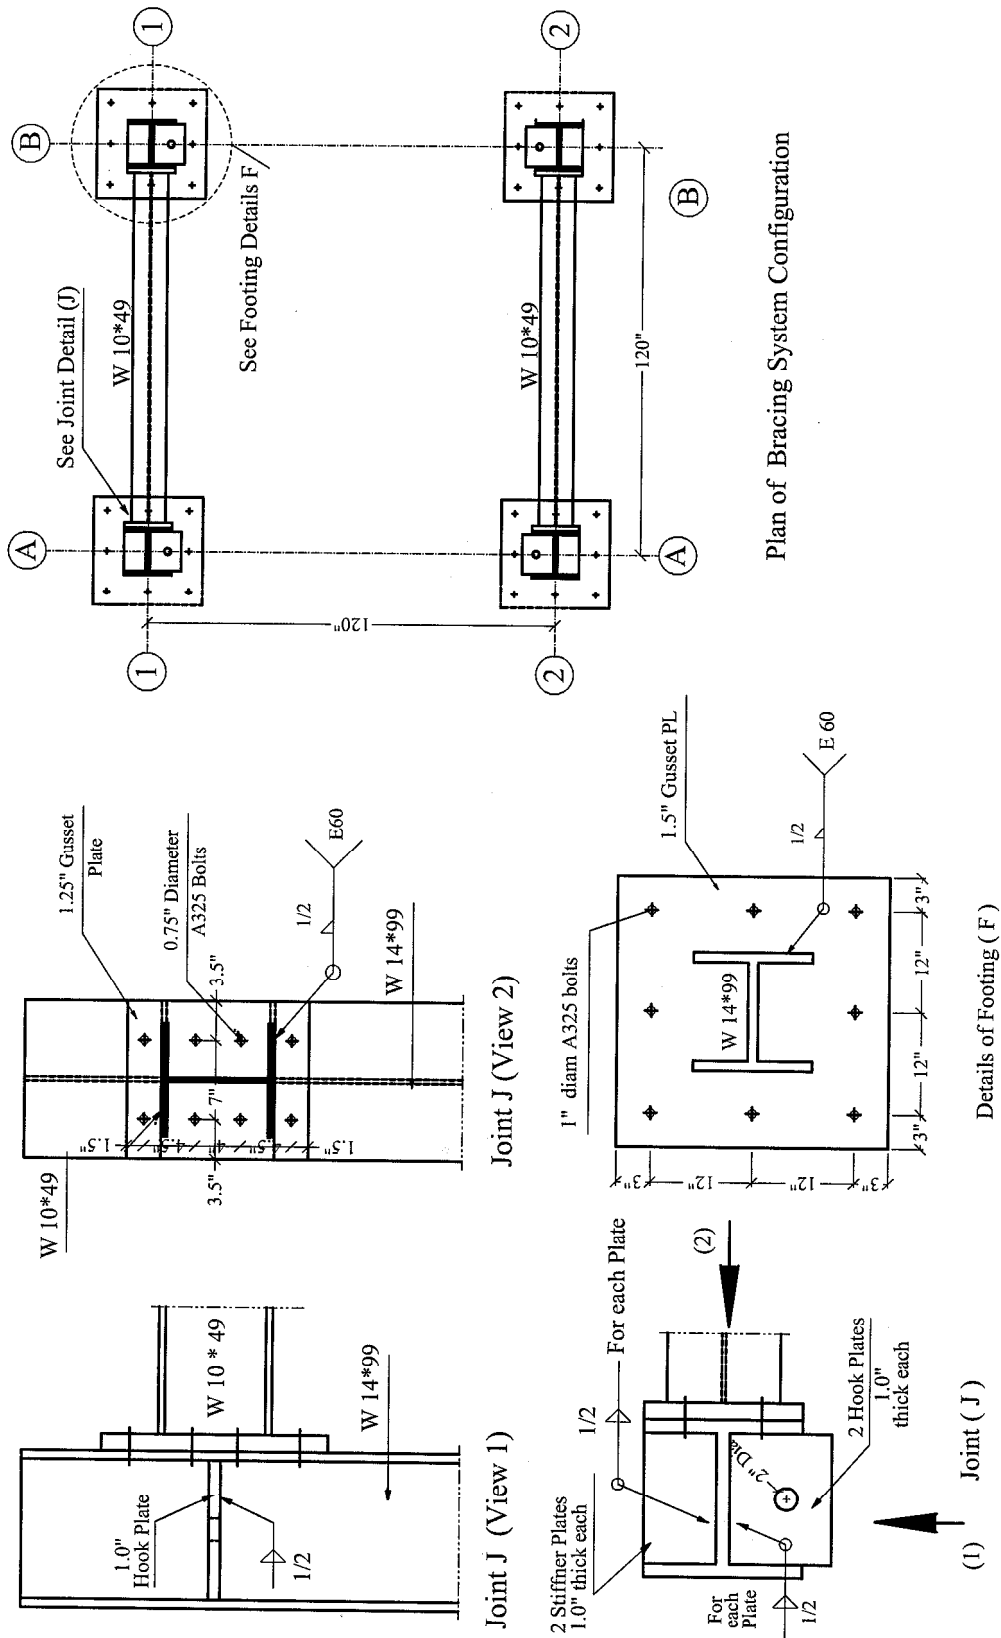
Section Details of Steel Stability System (English Units)
